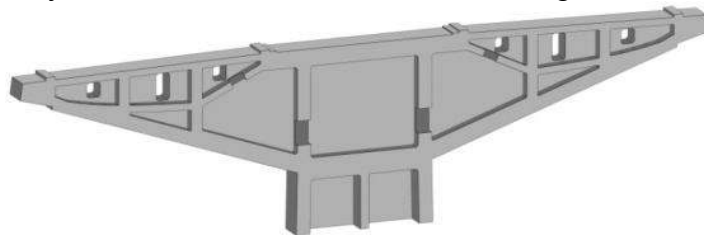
Cutaway Section of Typical Pier Cross-Head
